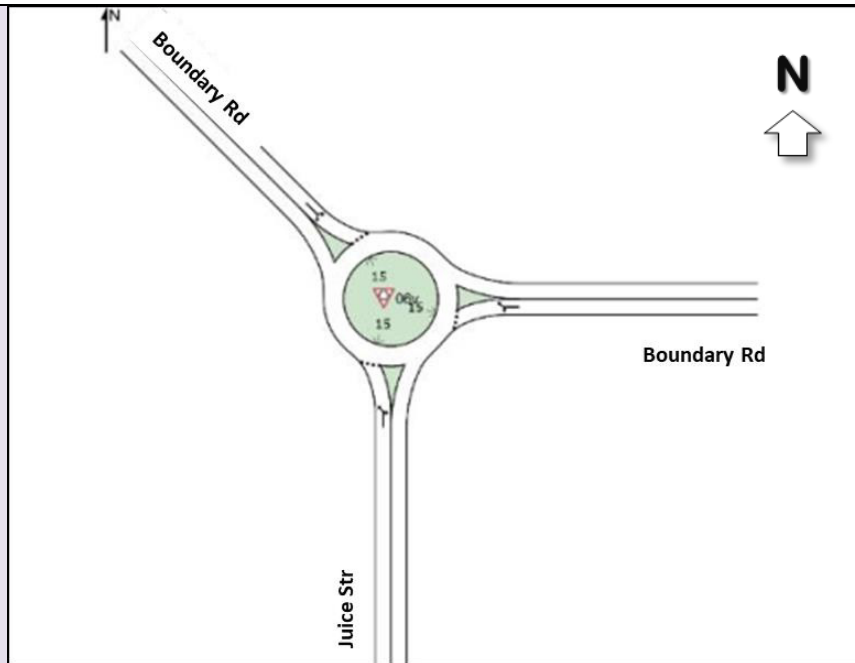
Proposed traffic circle configuration at the corner of Juice Street and Boundary Road
